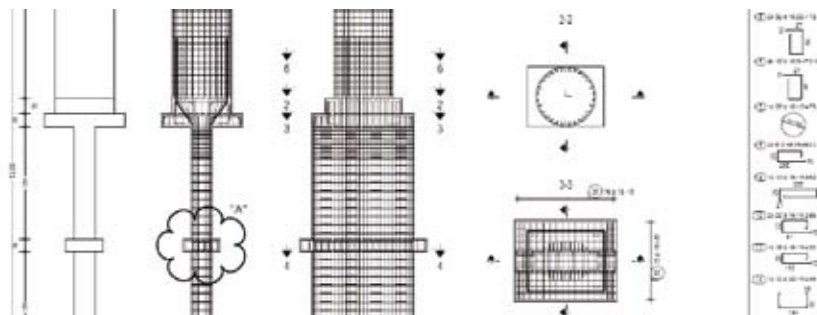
Element plan: portion of the plan automatically generated for the column.
